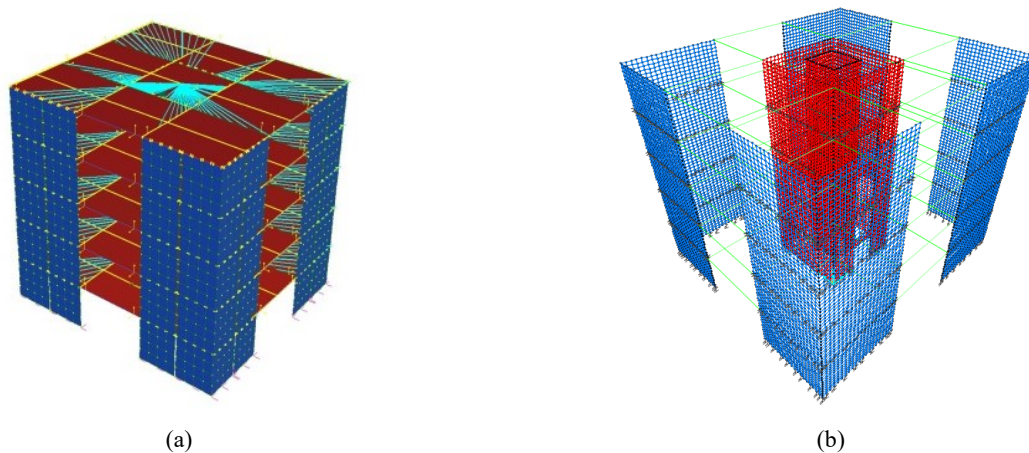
Examples of linear FE models of CLT buildings. (a) 5-storey building with vertical joints; (b) 5-storey building without vertical joints [1.25].
